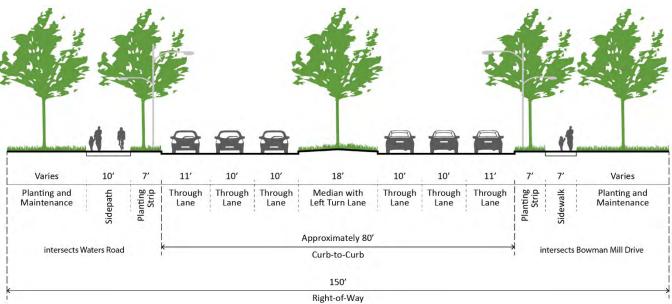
Proposed Germantown Road (north of the railroad tracks)
